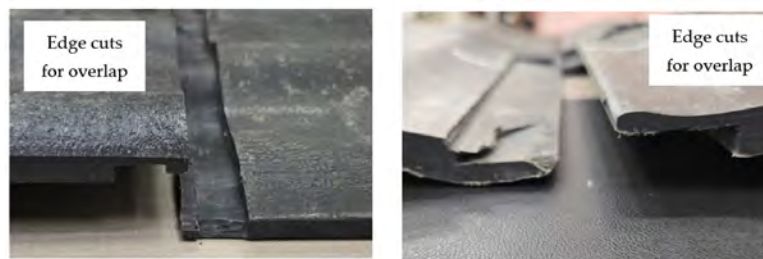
Edge modifications in recycled plastic corrugated sheets overlapping joints for full-scale slab assembly.
